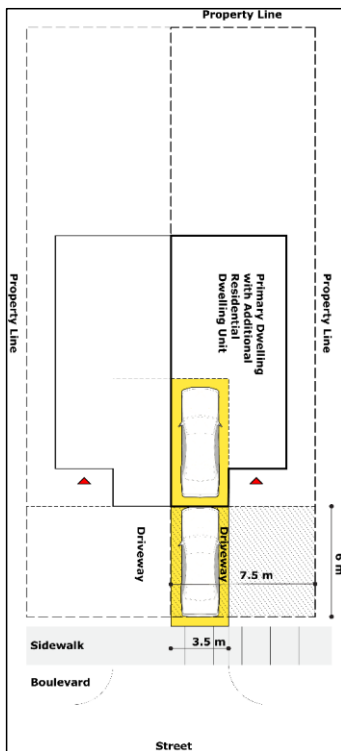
Single Detached Dwelling with Two Additional Dwellings
